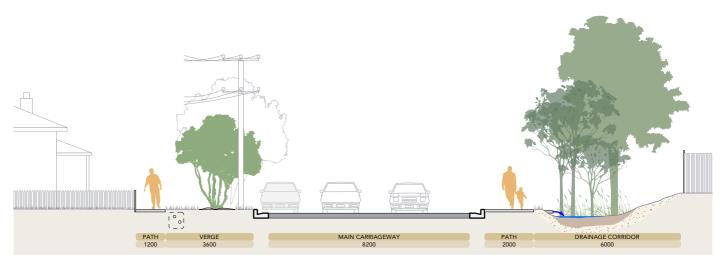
Typical collector and high transit street section. Source: RealmStudios
